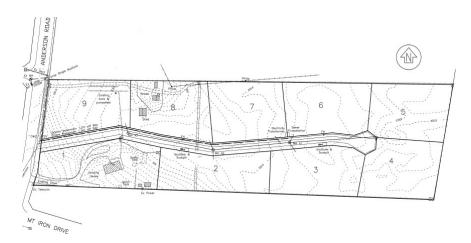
Original Paterson Pitts Subdivision Plan Showing Site Contours
